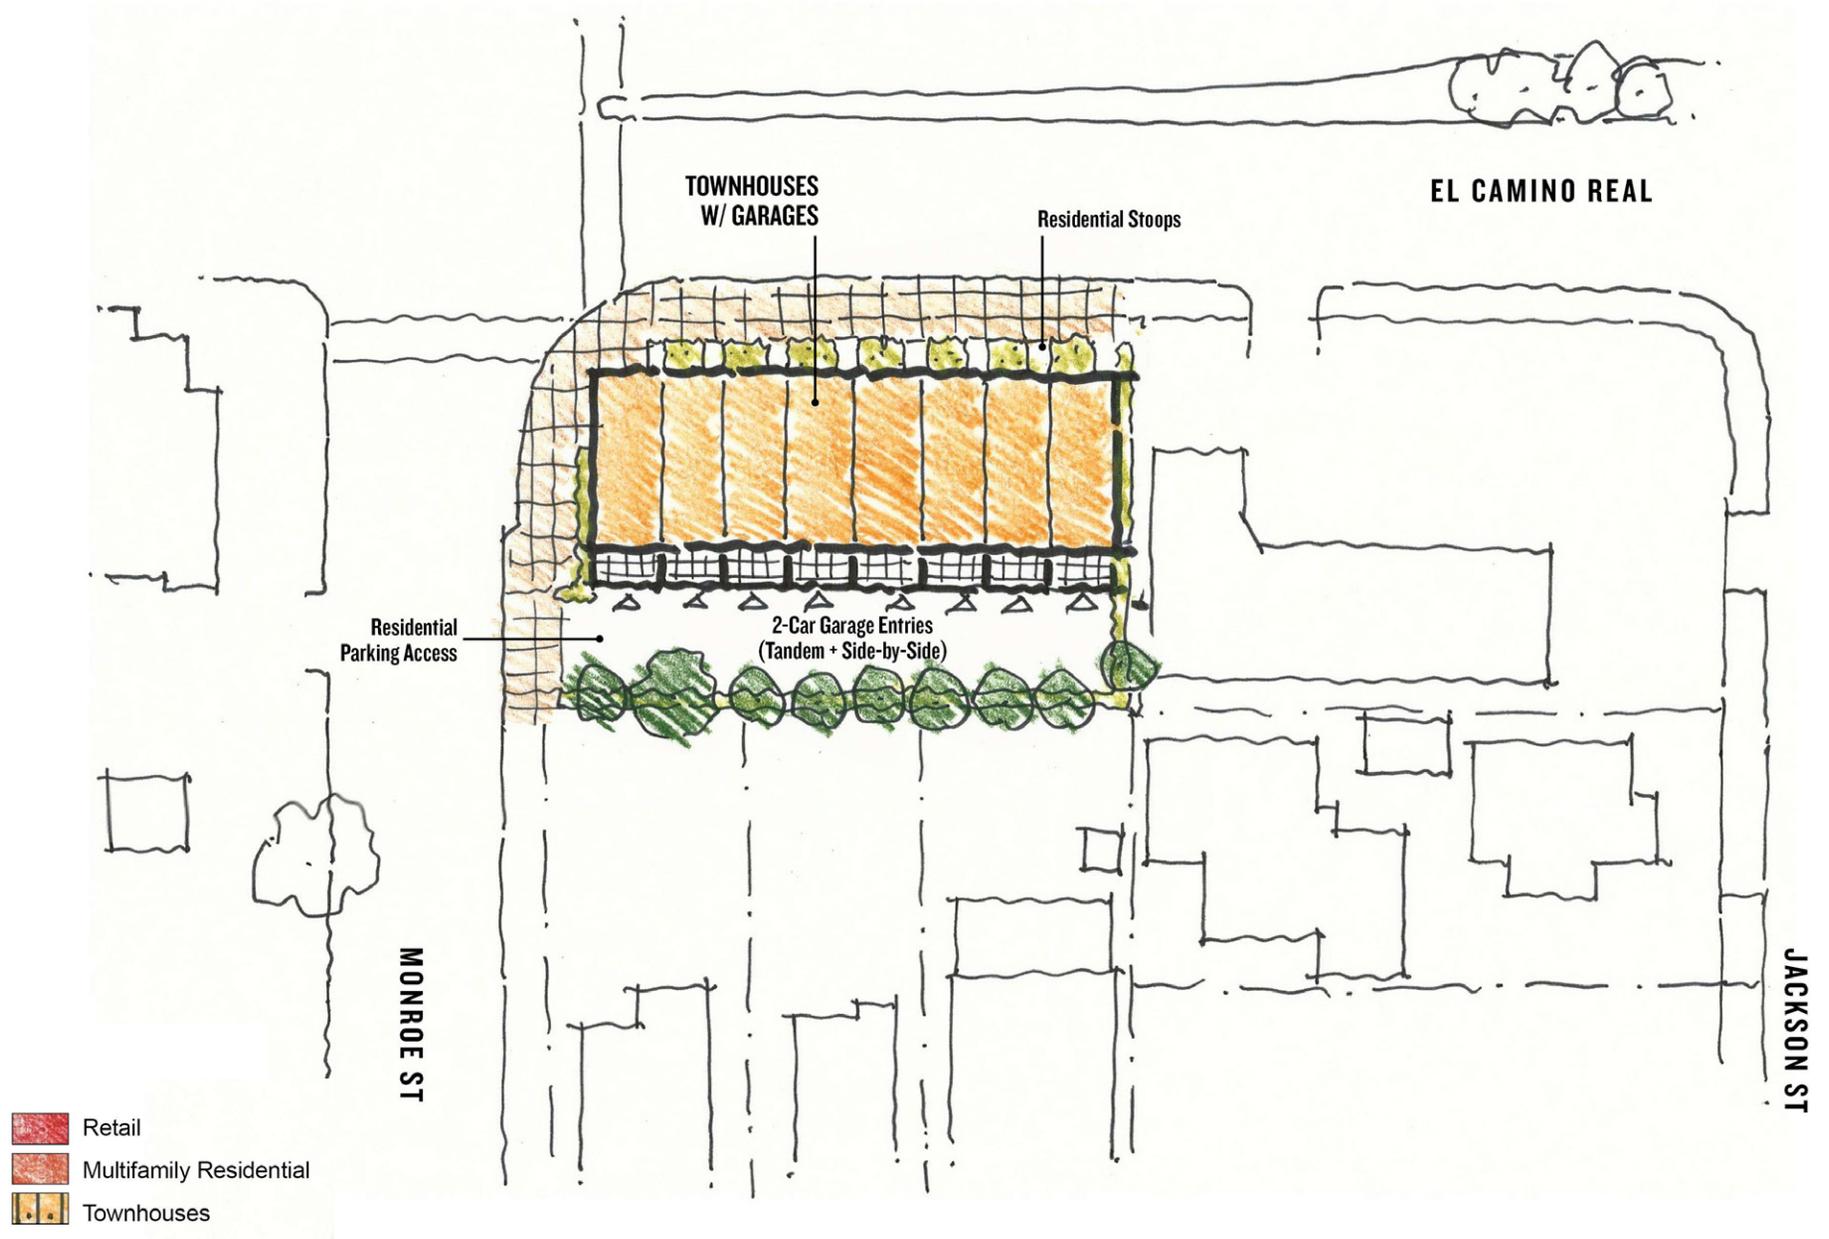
Corridor Residential Conceptual Plan 1 Cross Section
